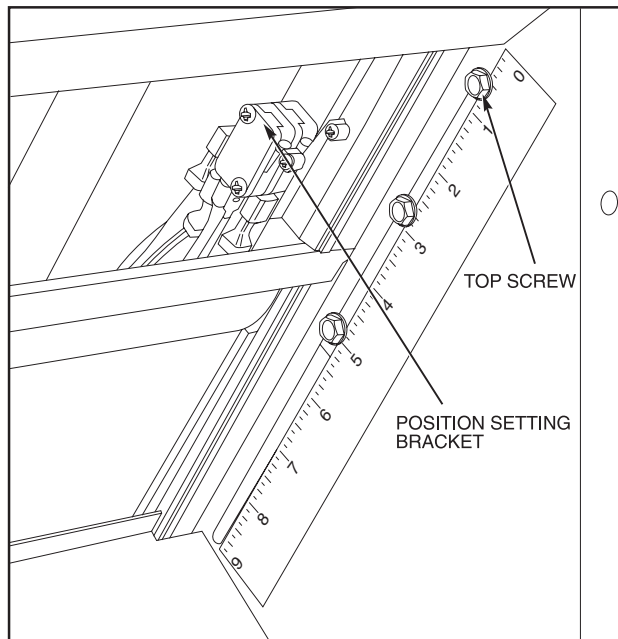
Durablade Economizer Minimum Position Damper Setting
